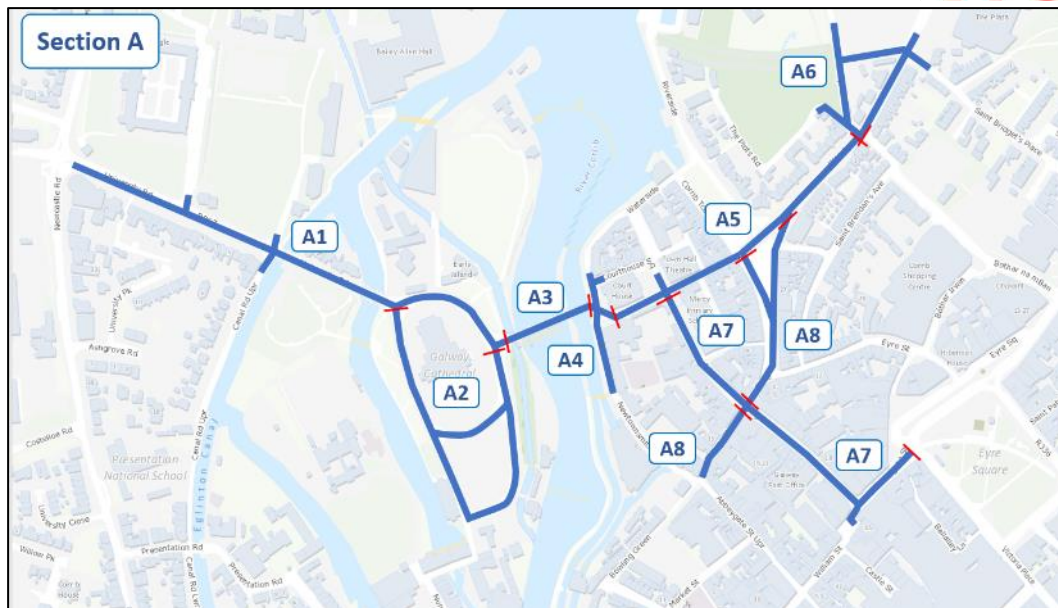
Proposed Sub Sections of Construction Phase – Section A
